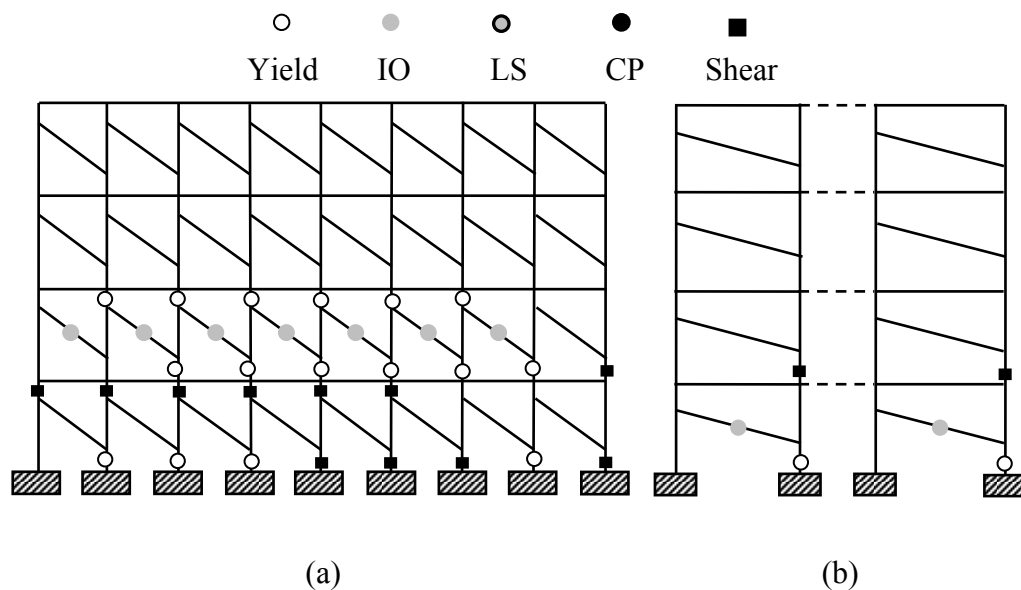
Collapse mechanism of four storey RC frame buildings with uniform infills designed for gravity loads only as per relevant Indian Standards: (a) typical longitudinal frame; (b) typical transverse frame.
